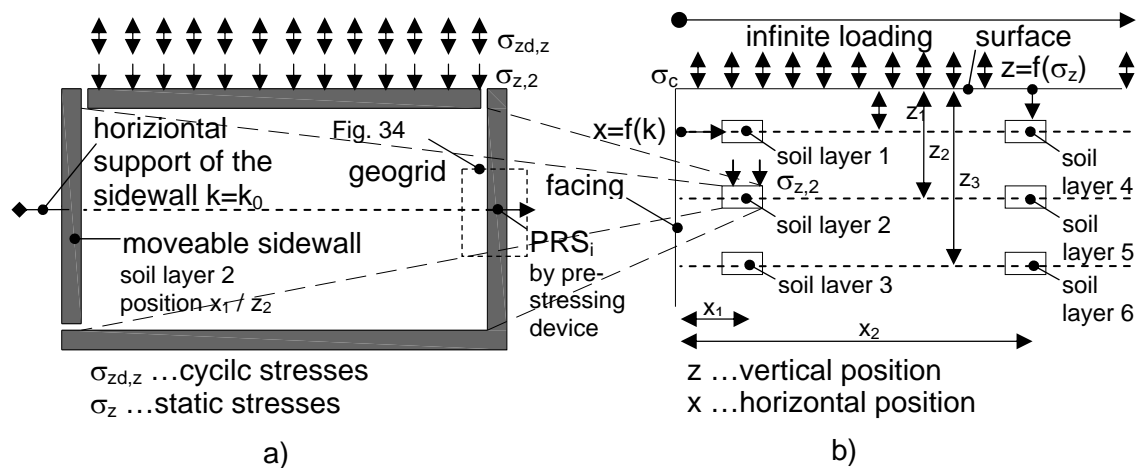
Schematic sketch: a) Biaxial static and cyclic loaded soil element out of soil layer 2 reinforced with a geosynthetic b) typical geogrid reinforced soil wall including the positions of the biaxial loaded soil element (modified with respect to Burgstaller 2011).
